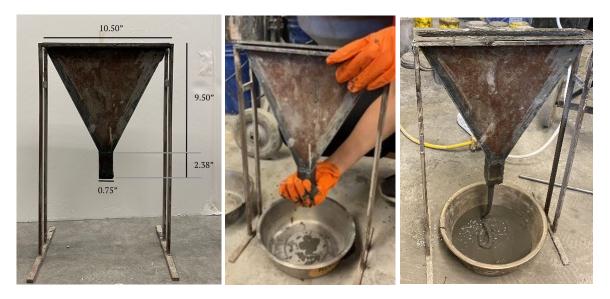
Mini V-funnel test set up (from left to right: test setup dimension; blocking of mini-Vfunnel opening for mixture to settle; and UHPC mixture flowing out from the opening)
